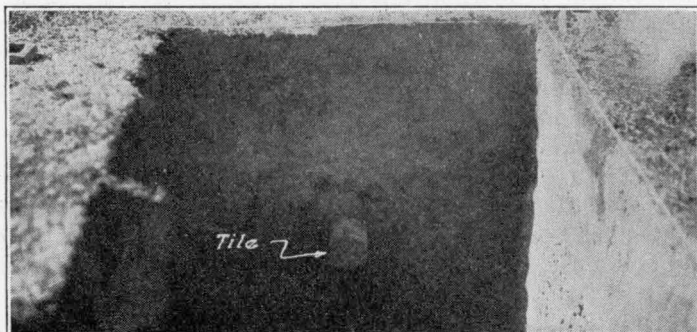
OUTLET TILE EMBEDDED IN THE EXCAVATION WALL
